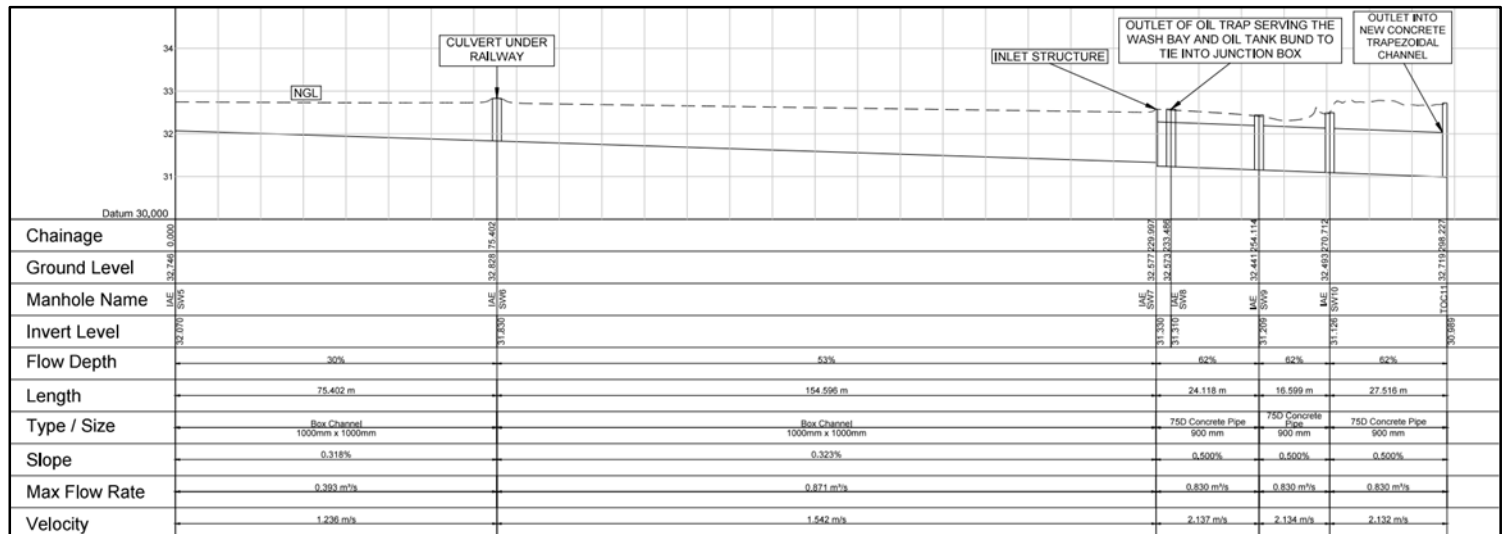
Long section of proposed new stormwater infrastructure between IAE SW5 and TOC11.
